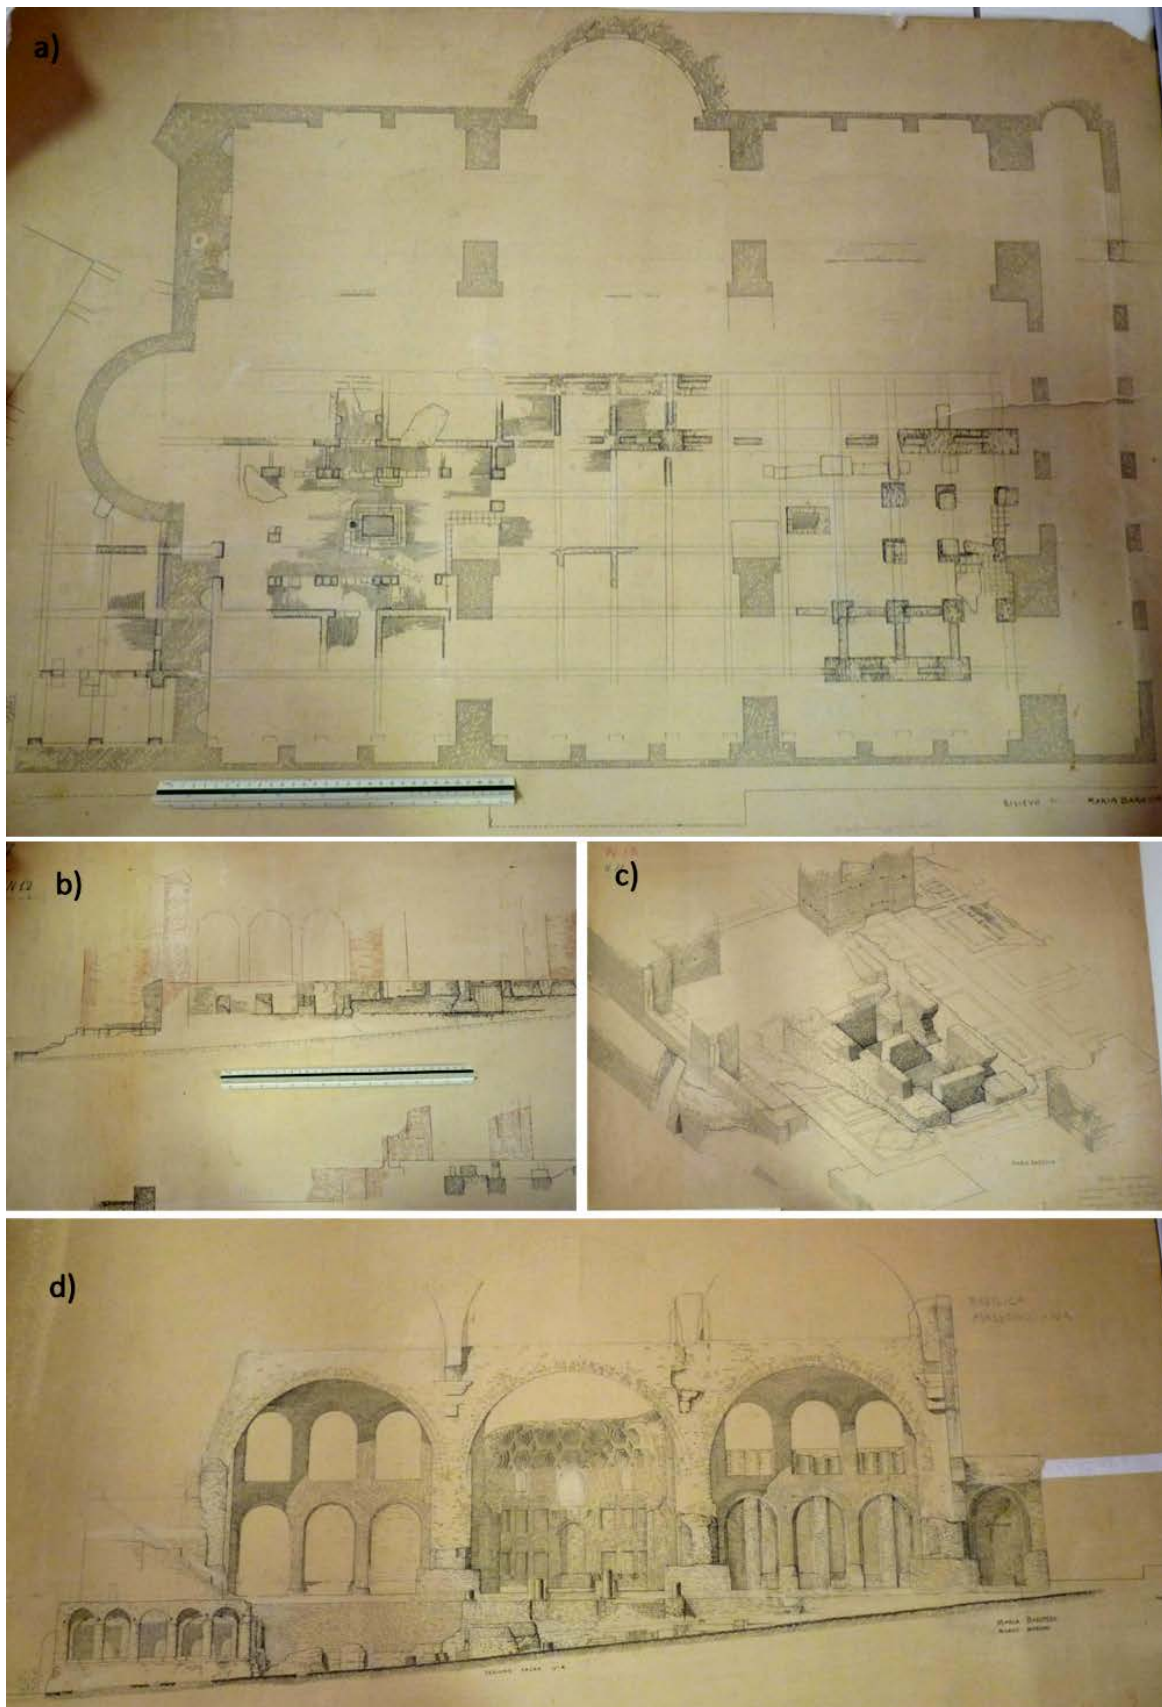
Drawings of the Basilica of Maxentius by Maria Barosso during the excavations of the 1920's and 1930's (pictorial archive in Palazzo Altemps, Rome). A) Floor plan showing excavations of pre-existing structures; b) longitudinal cross-section; c) detail of pre-existing structures under south nave; d) elevation of remains with outline of missing cross vaults.
